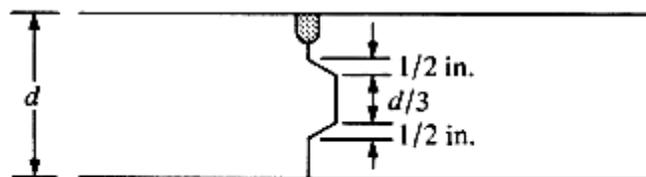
Typical Hinge Joint (Keyed Joint)
